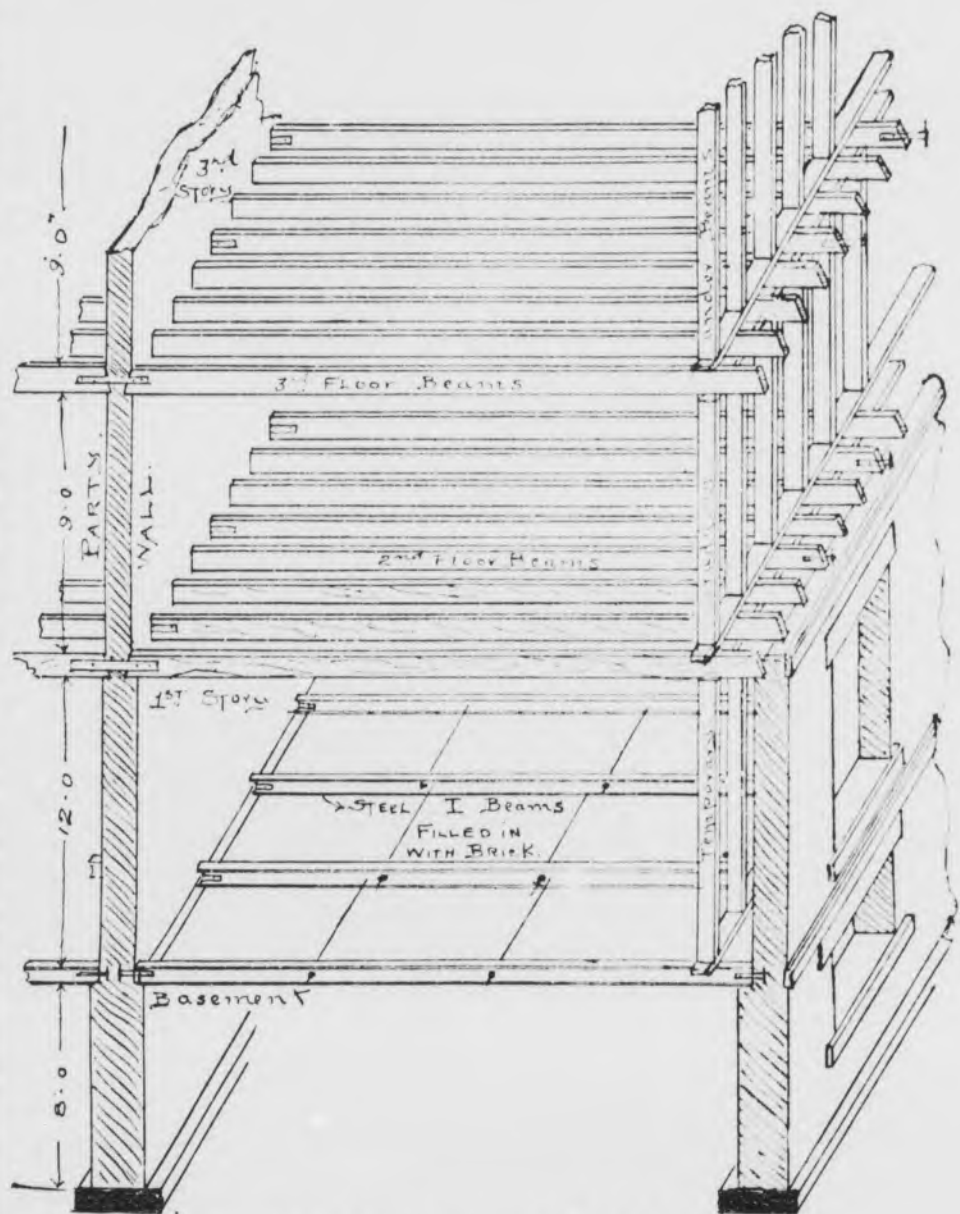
FIG.—PROJECTED VIEW OF FRAMING OF A BRICK HOUSE.
